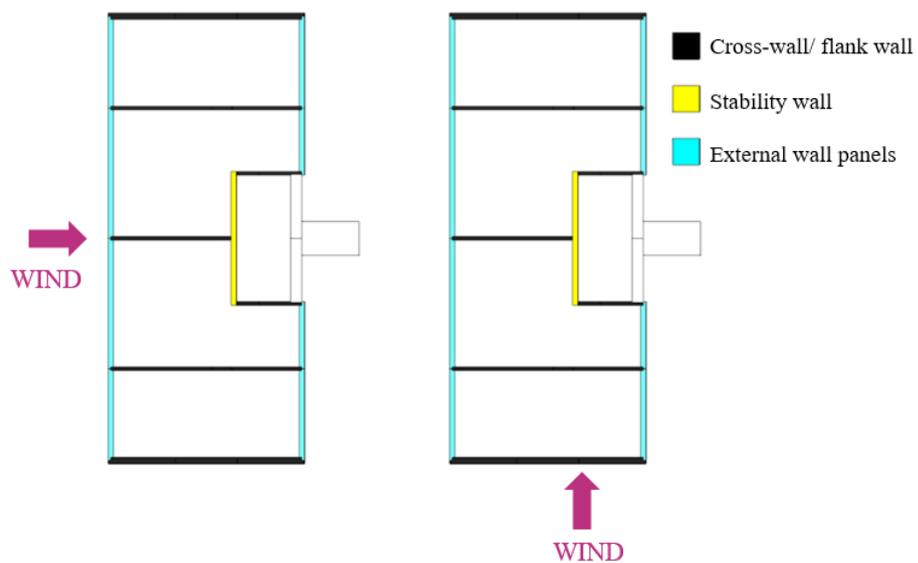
Wind loading perpendicular to each building face of the residential block was considered
